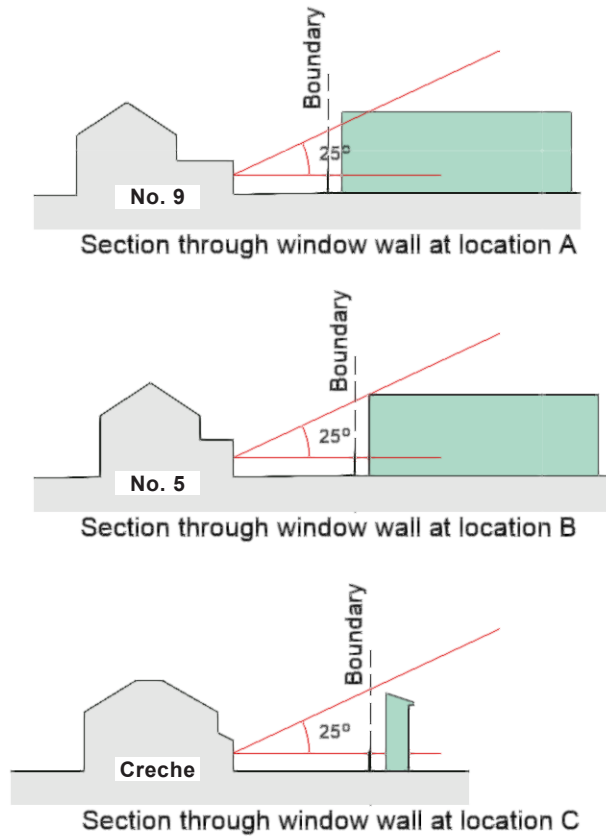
Section perpendicular to window wall at locations indicated in Figure 2.
